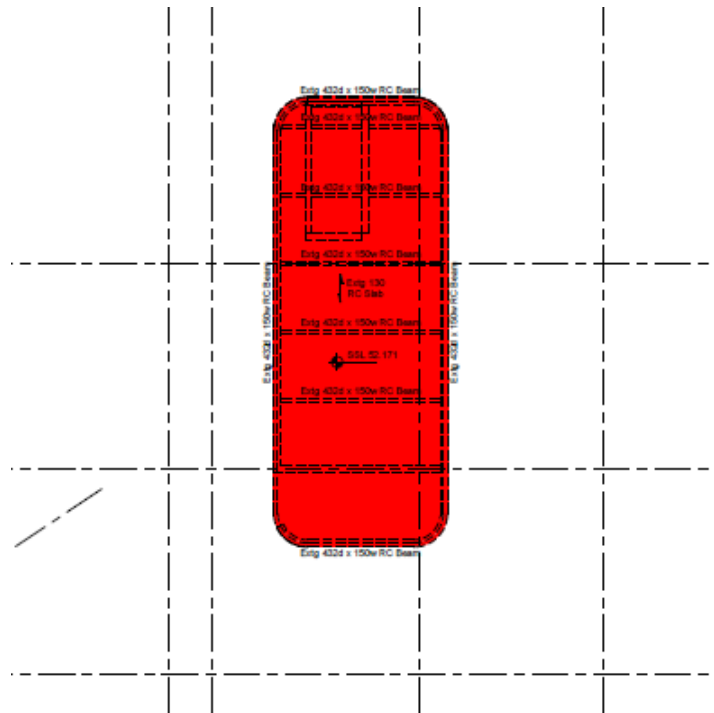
Roof Structure to be removed at Kingsway building as indicated in the structural drawings
